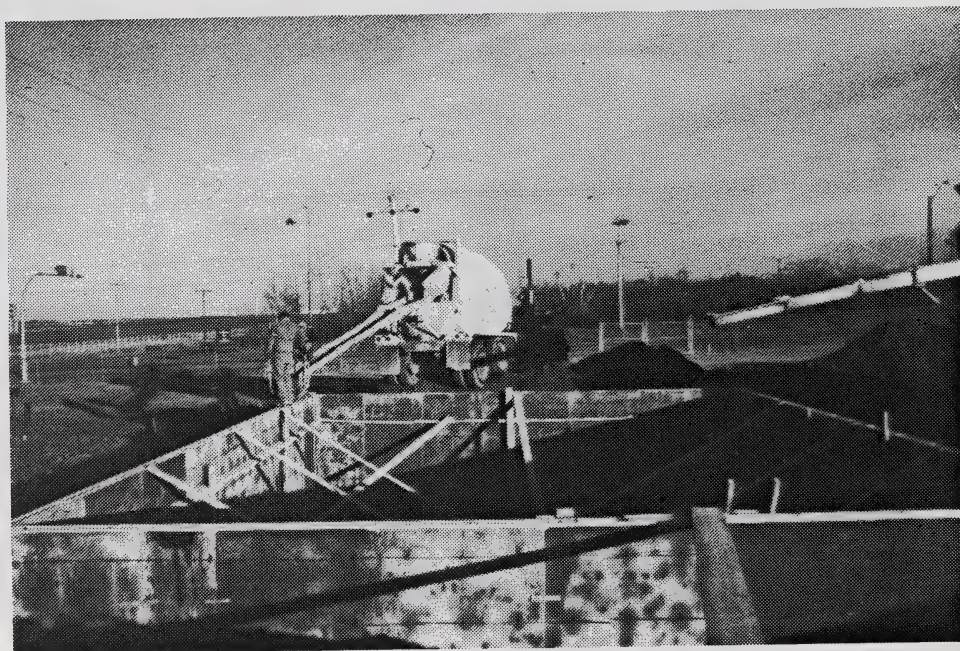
WESTWARD VIEW, POURING CONCRETE FOR FOUNDATION WALLS
